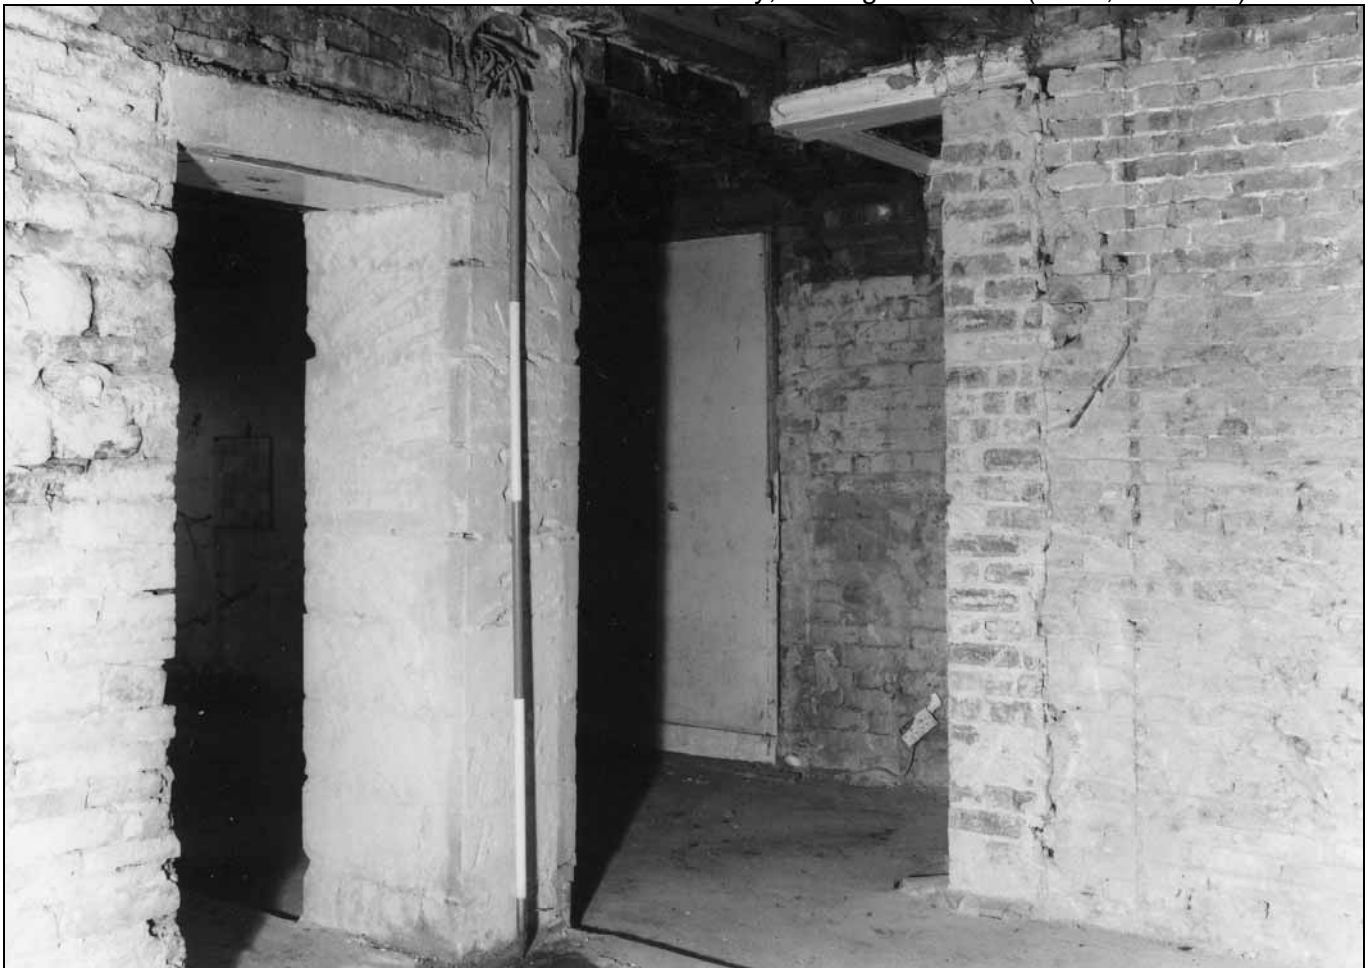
Ground floor room to rear of housebody, looking south-east (film 2, frame 18)
